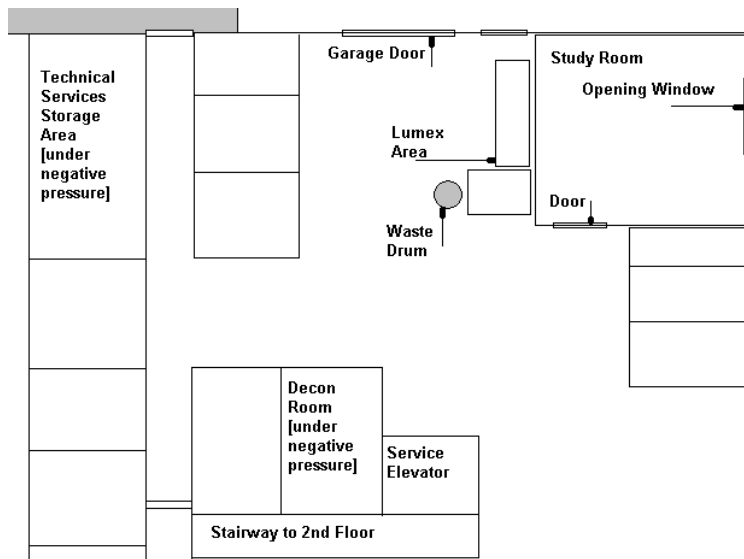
Warehouse section - study room, garage door and negative pressure rooms (not to scale)
